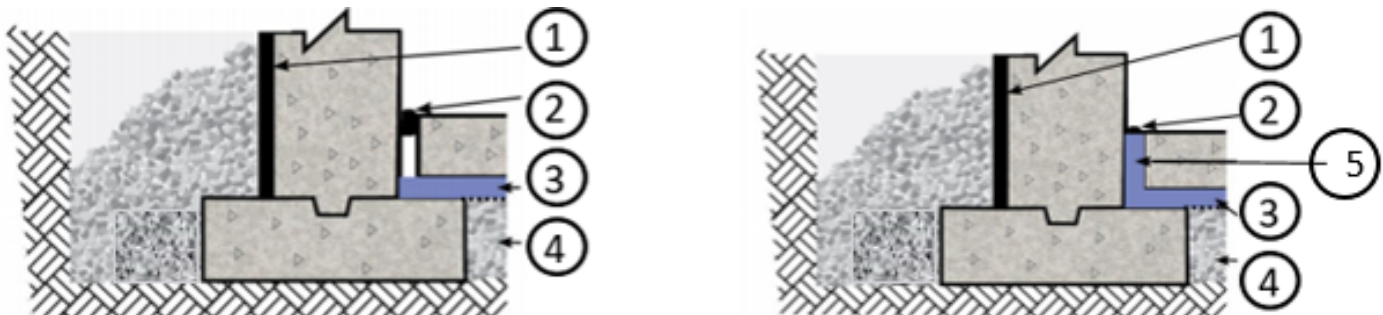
Application of WALLTITE® CM01 for radon control beneath concrete slab, with geotextile/100 mm gravel or without geotextile/115 mm gravel bed.
